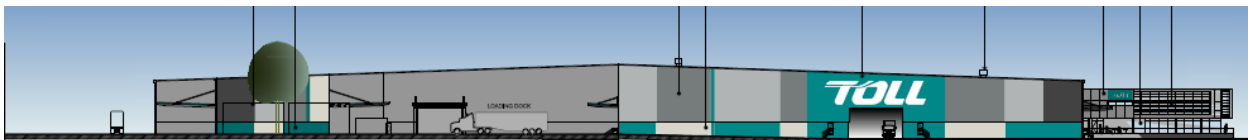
PROPOSED WALL SIGN NORTHERN ELEVATION
